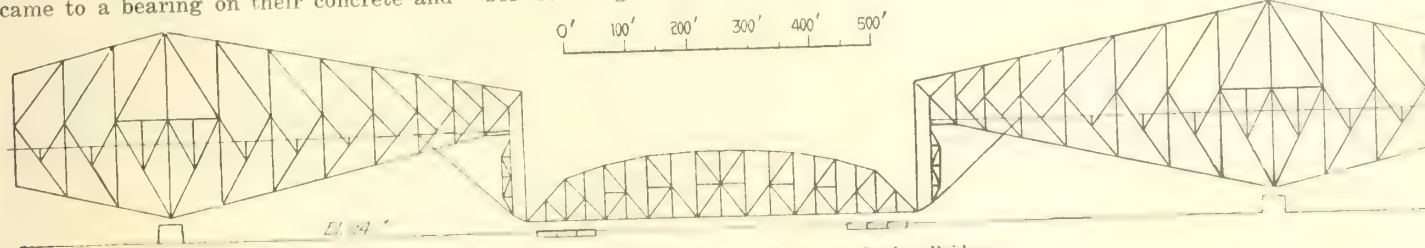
General scheme for hoisting suspended span, Quebec Bridge.
